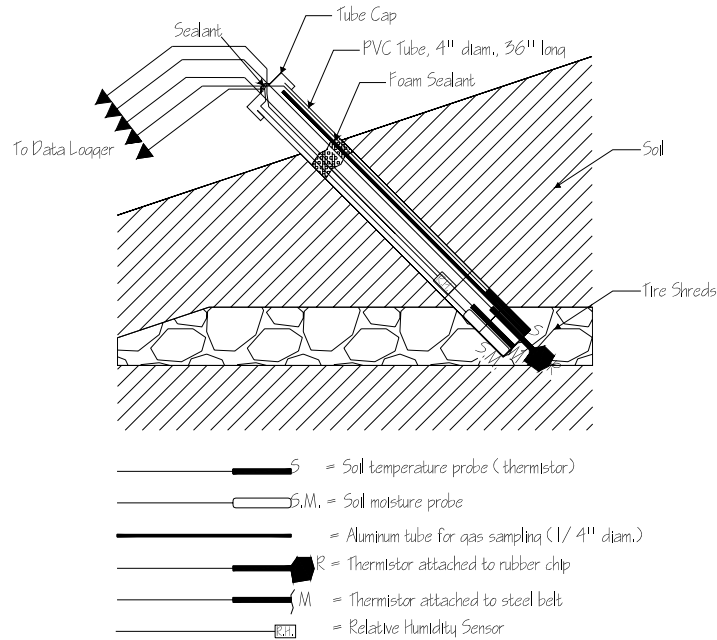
Typical Cross-section of Instrumentation in Layered Section (not to scale)
